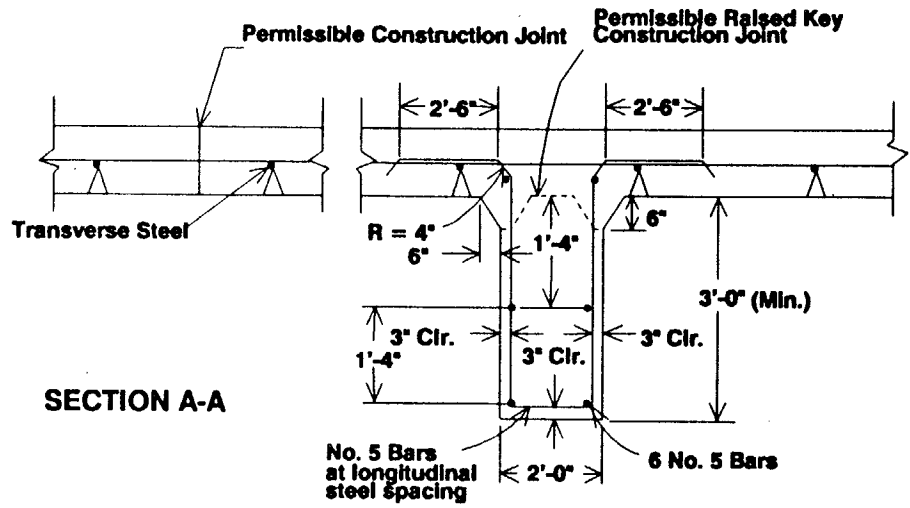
Recommended WF Steel Beam Terminal Joint Design
